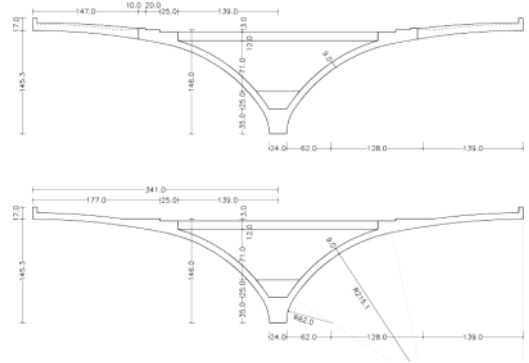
Roof beam cross-section dimensions in the skylight area (top) and between them (bottom). (The author, from project documents).
